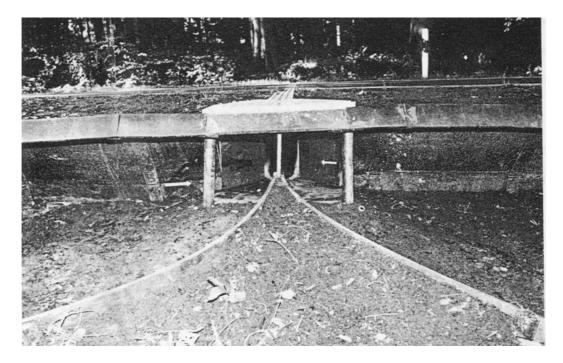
Photograph of an overhanging fence to stop toads crossing the road and guiding them into culverts (Brehm 1989).
